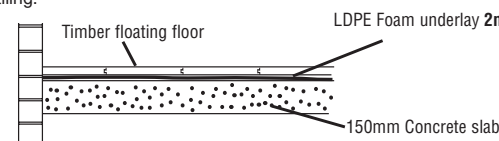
Floating timber floors over concrete slab - To insulate impact noise from timber floors to concrete slab.
